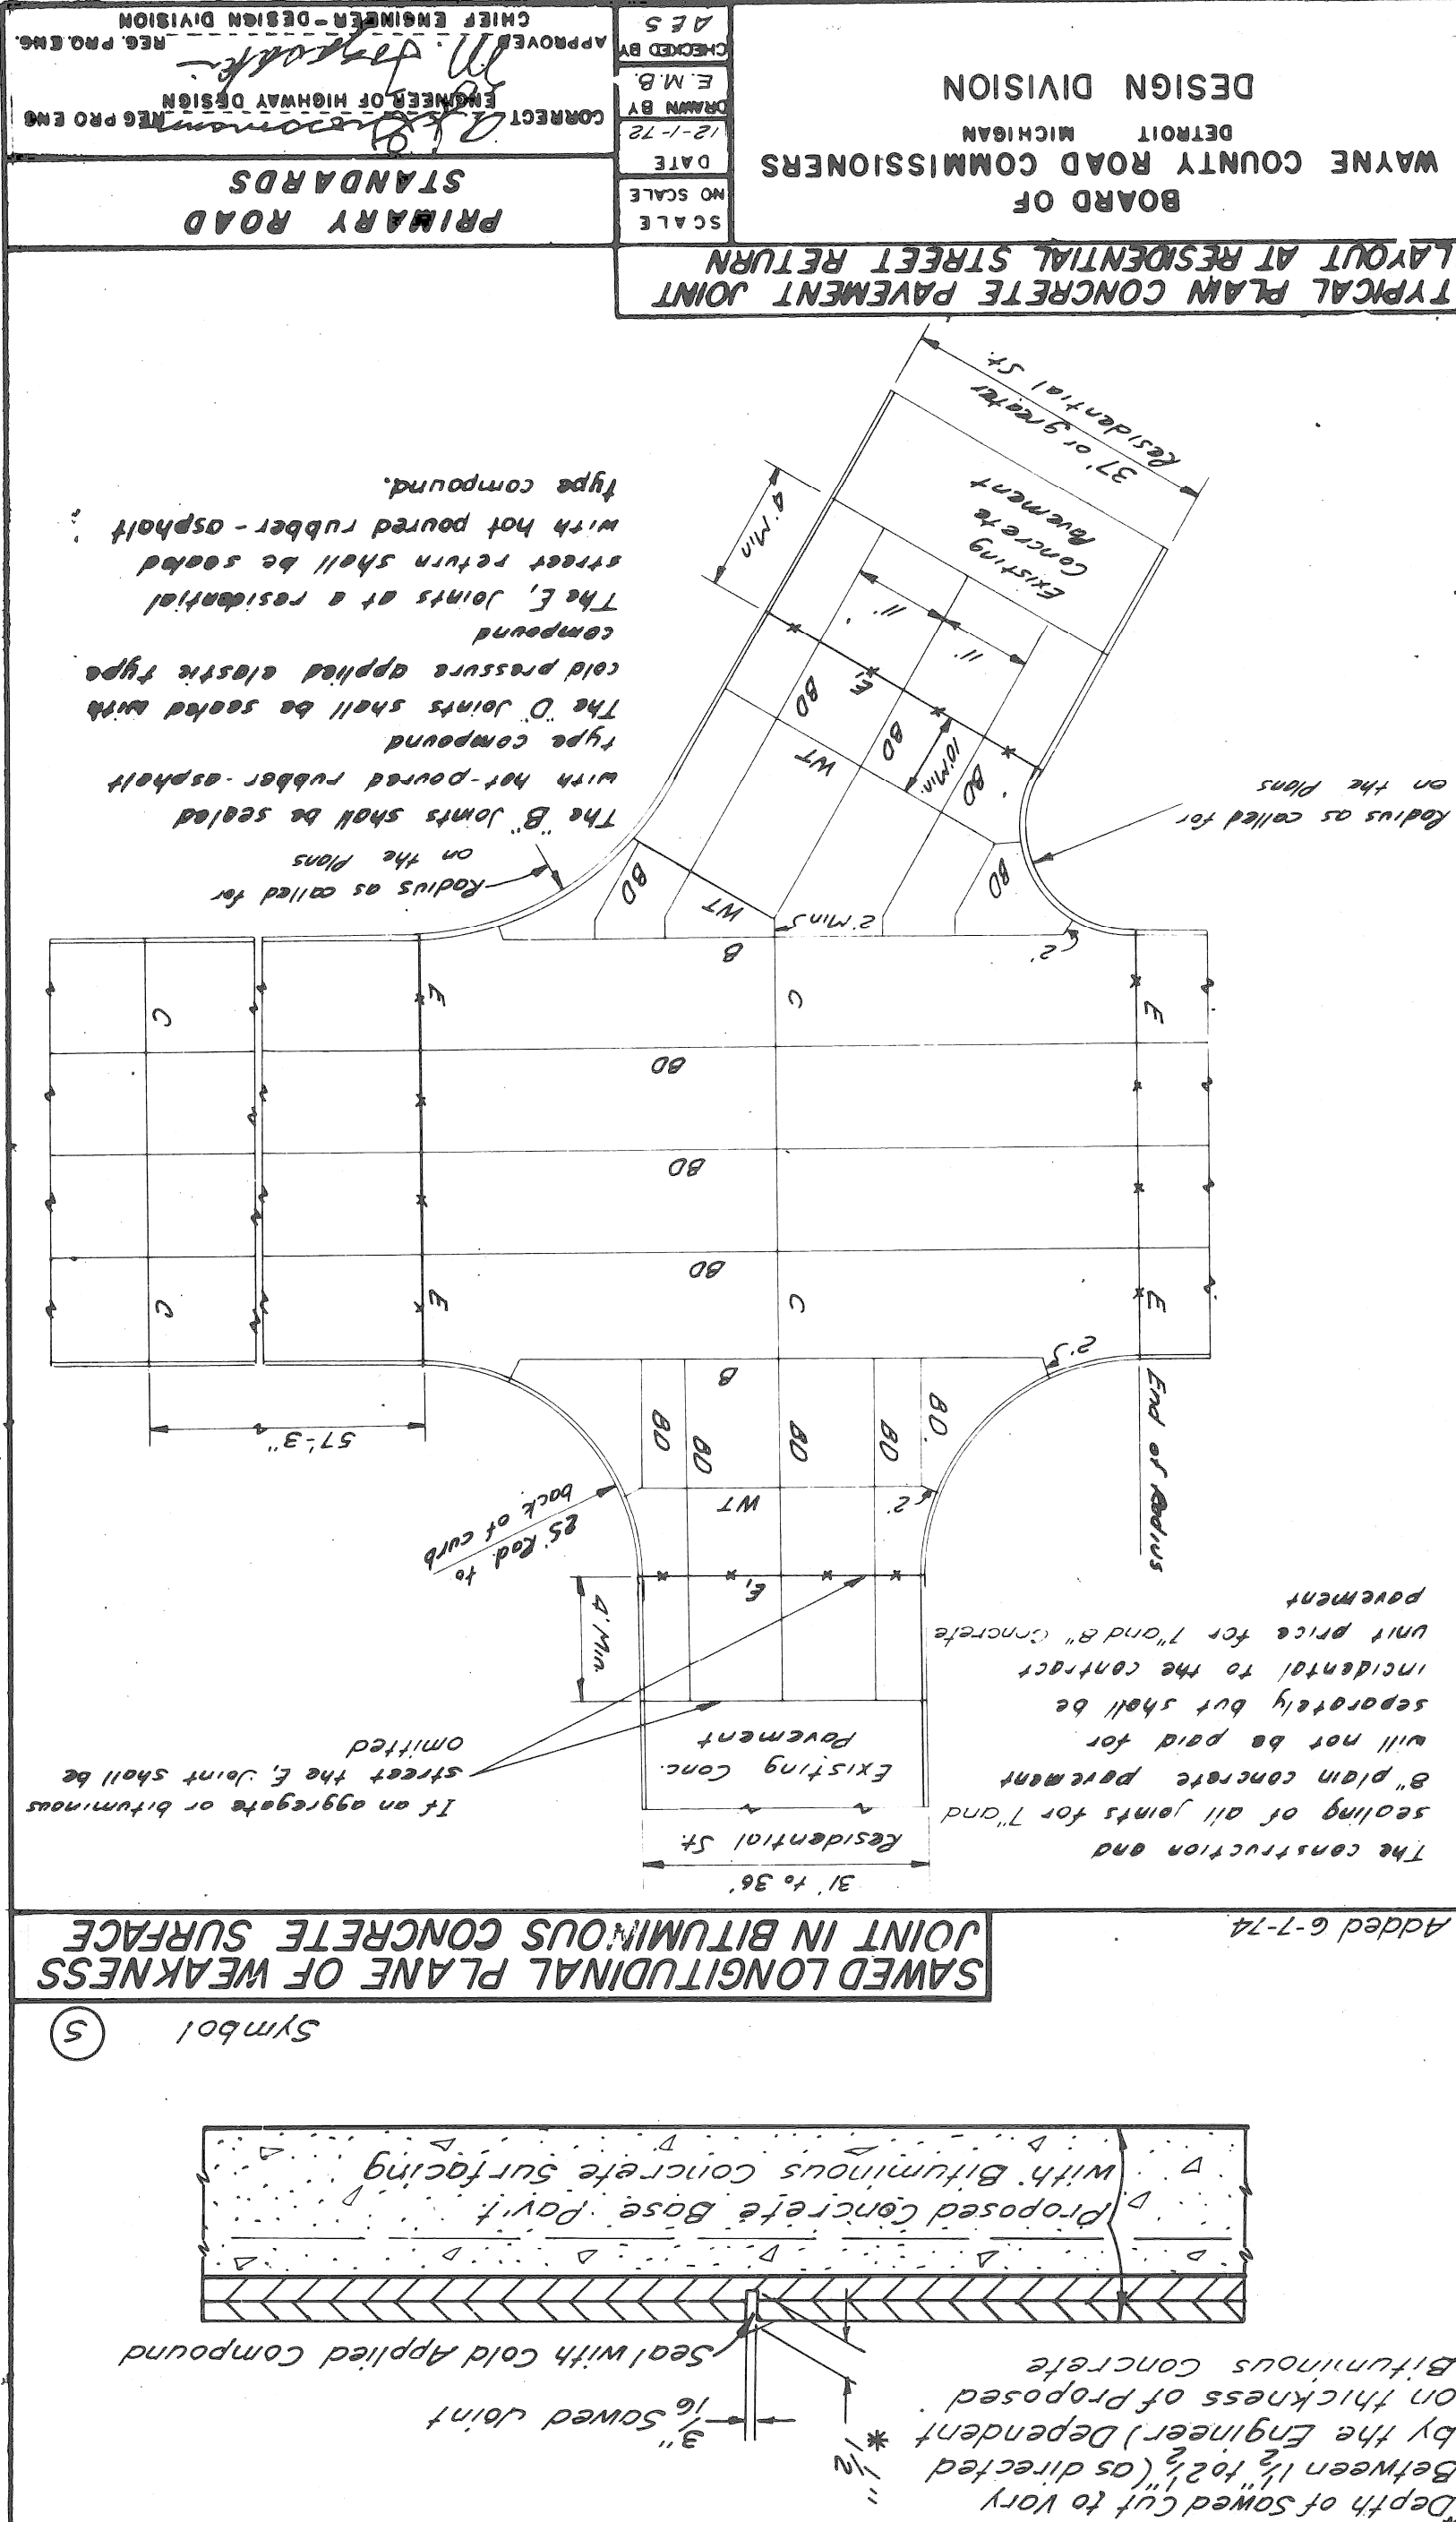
DETAIL OF CURB RETURN JOINING EXISTING PAVEMENT
